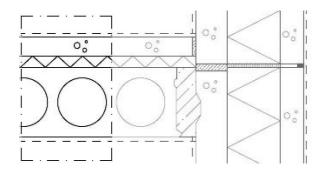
Structural section of modern concrete building. External walls are prefabricated concrete sandwich panels, and intermediate floors are, for example, prefabricated hollow-core slabs (approx. 270-370 mm). A thermal insulation layer (approx. 20-50 mm) on the top of the hollow core slab has been used in the 2000s (Weijo et al. 2019).
